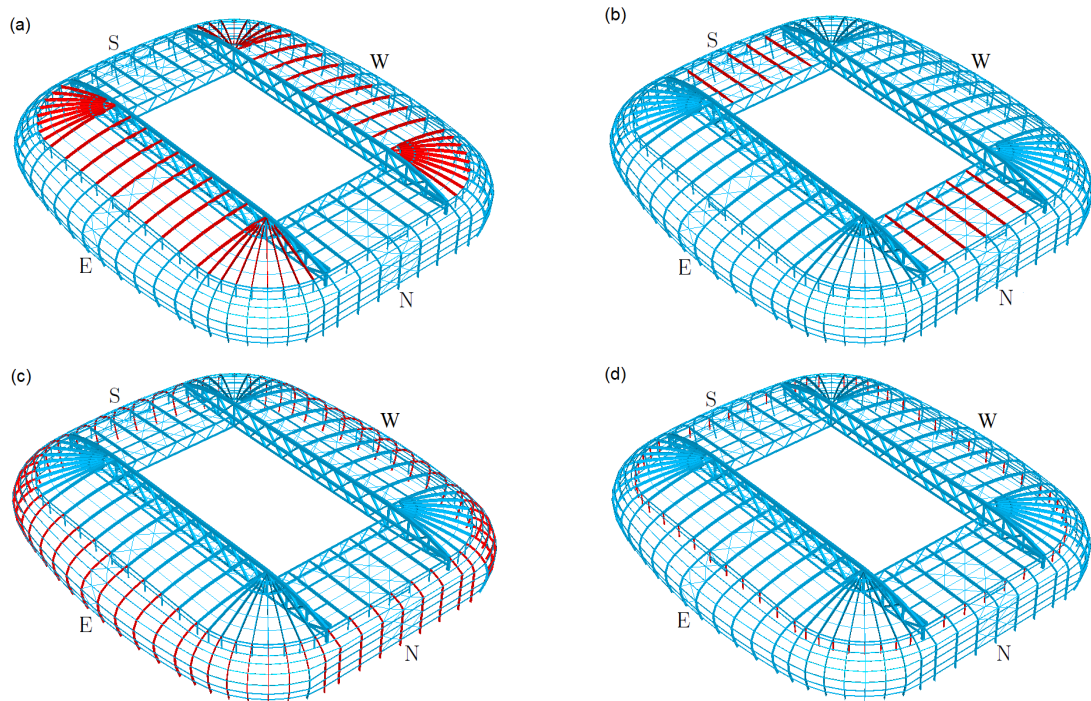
In red, beams of the (a)-(b) roof-bearing system, (c) ambulatory-bearing system and (d) Columns (image from [FinelG \(1999\)](#)).
